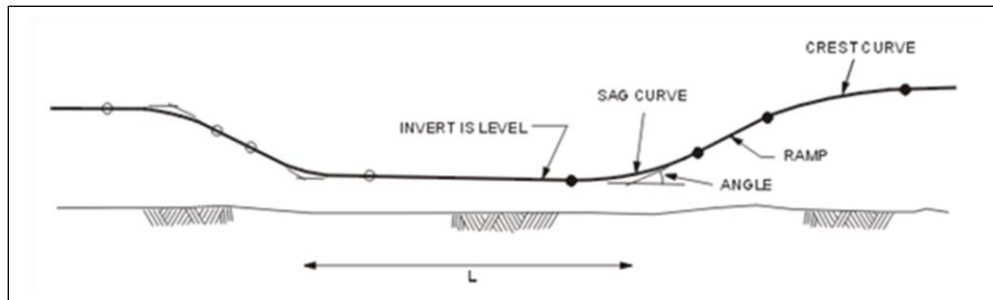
LONGITUDINAL SECTION OF A TYPICAL FLOODWAY [16]
